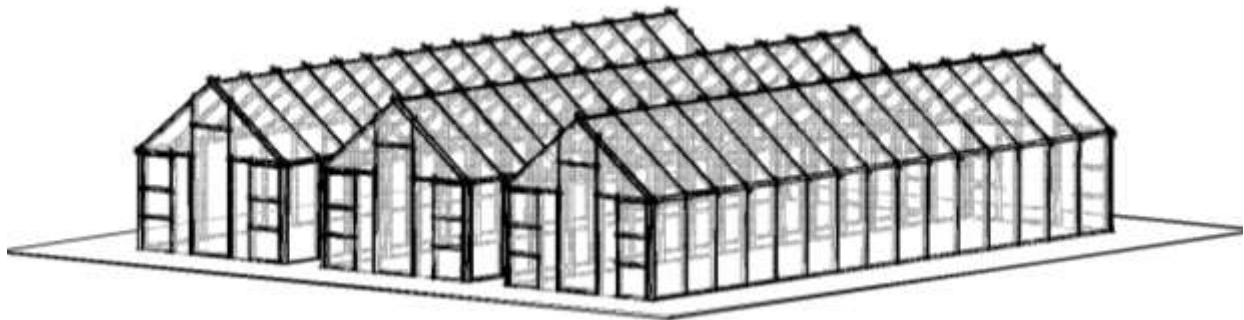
Sketch of traditional greenhouse structure, multiple installation
